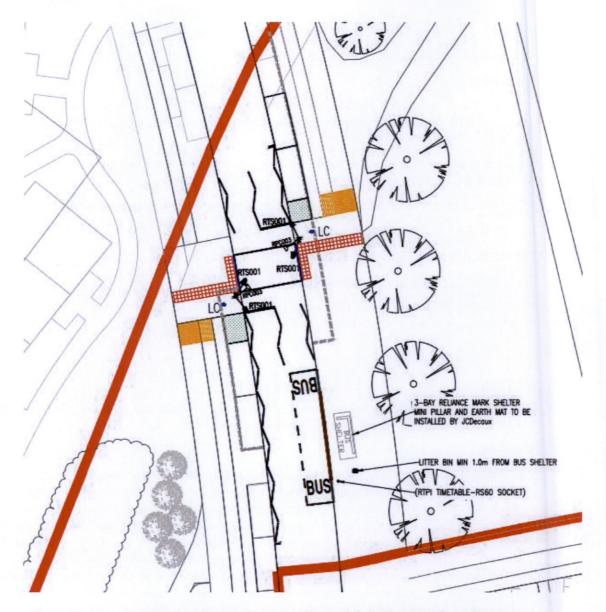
Proposed northern toucan crossing and Celbridge Link Road Bus stop
